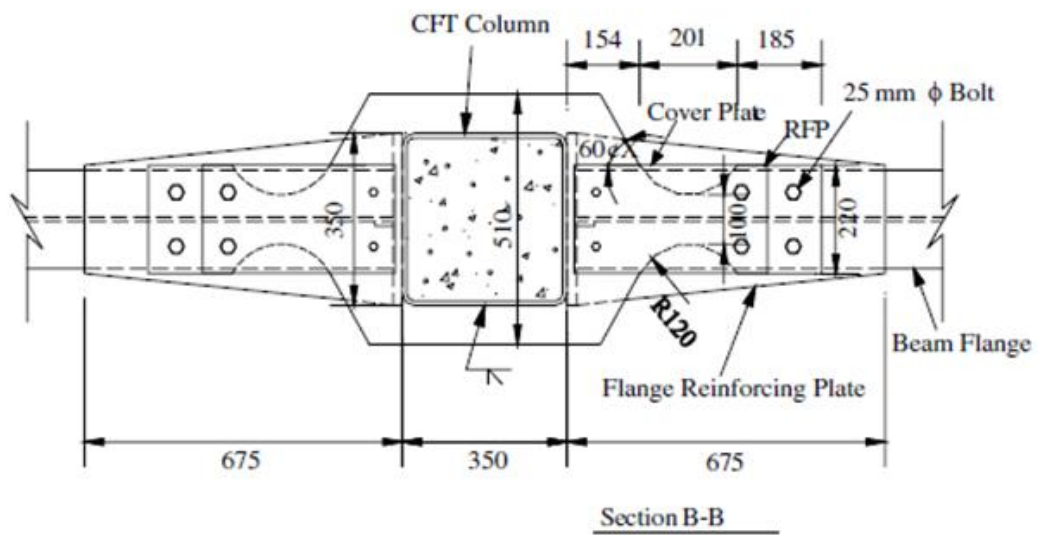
Section B-B of the PT beam to CFT connection (Chou et al 2006)
